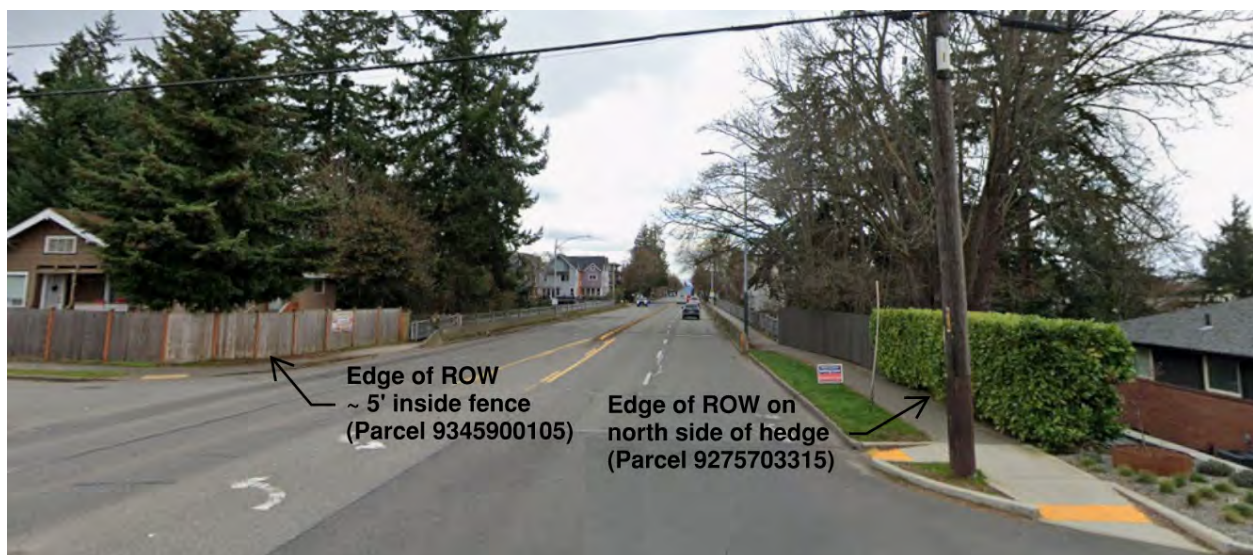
East End of Bridge – SW Admiral Way (Looking West Toward the Bridges)
